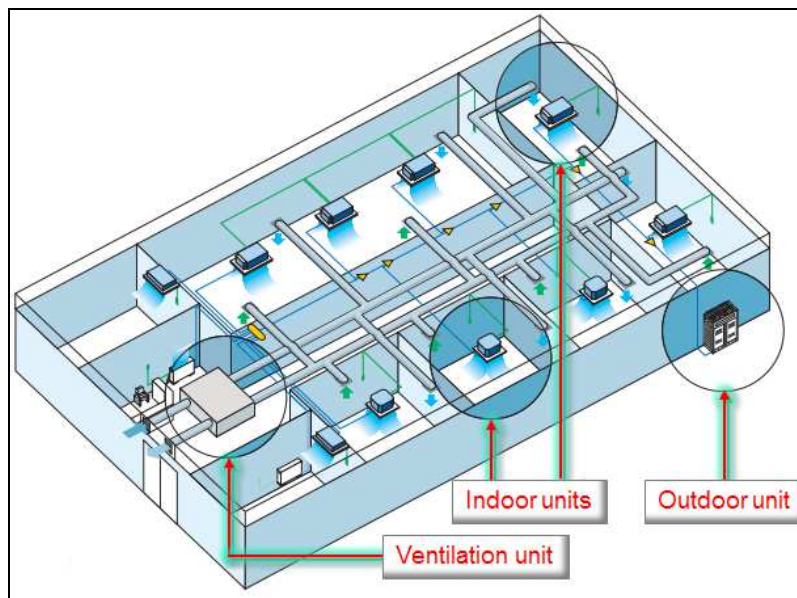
A building equipped with an outdoor unit, several indoor units and a ventilation unit
